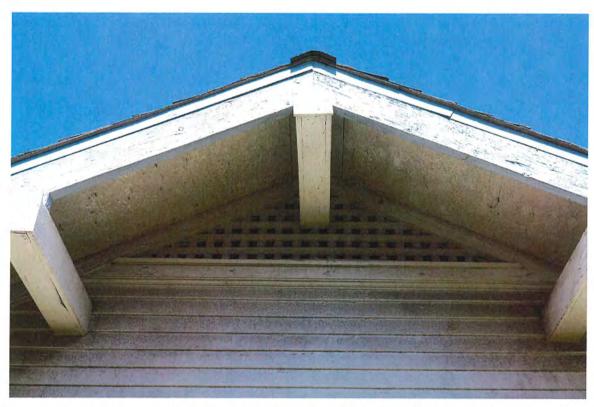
Close-up of a gable with latticework on the 1947 addition made to the south façade.
